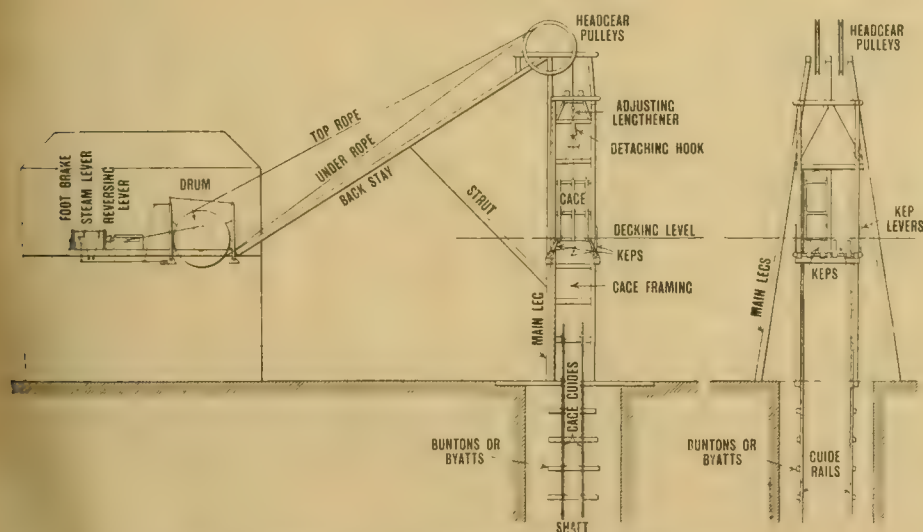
DIAGRAM OF HEADGEAR AND WINDING ENGINE.
